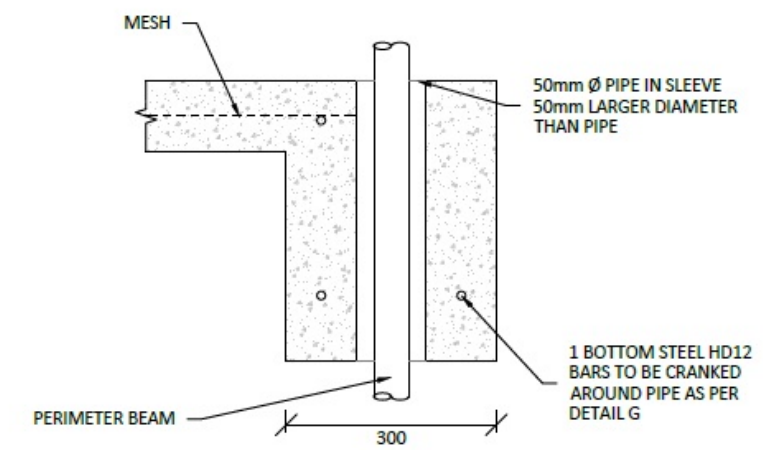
DETAIL G - TYPICAL PIPE PENETRATION DETAIL
